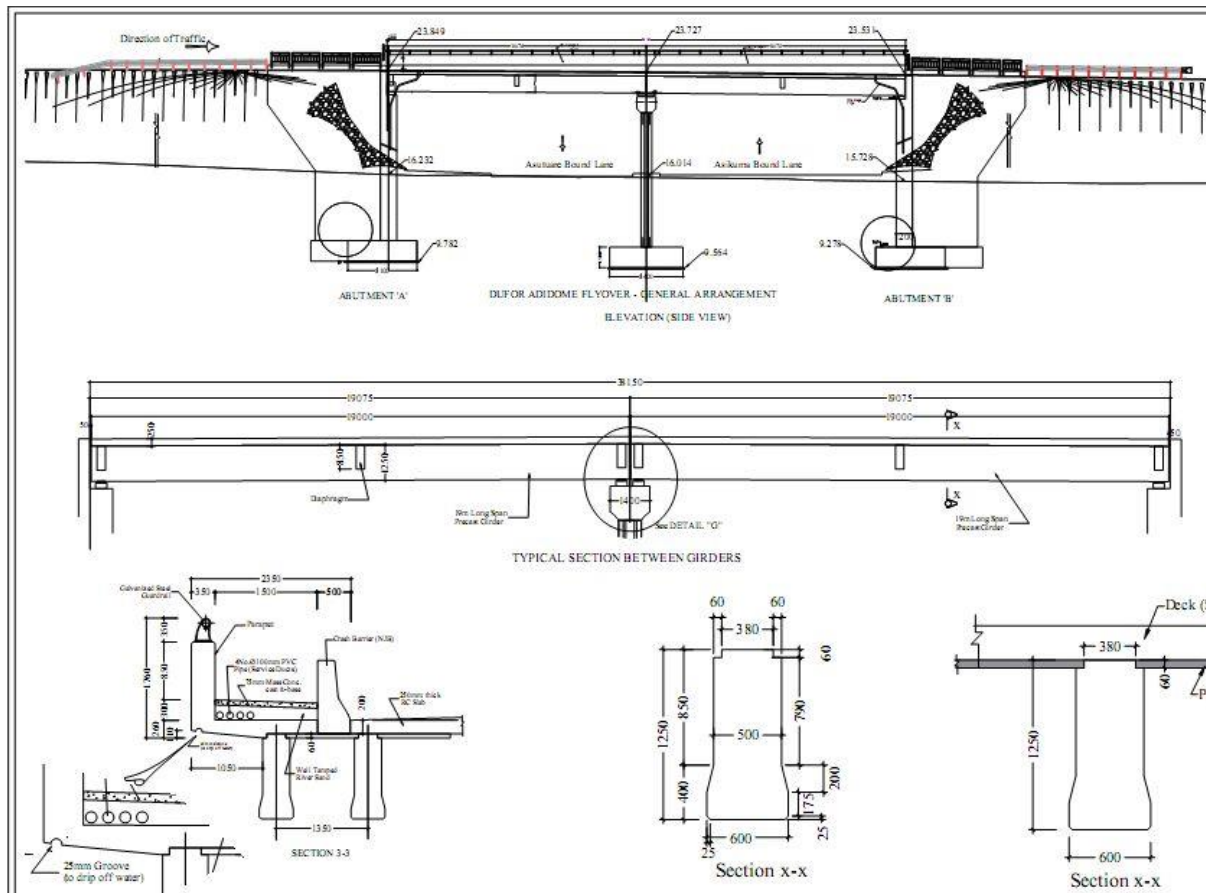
Bridge on Dufor Adidome Interchange CH. 29+350 on Section 3 Project Road
